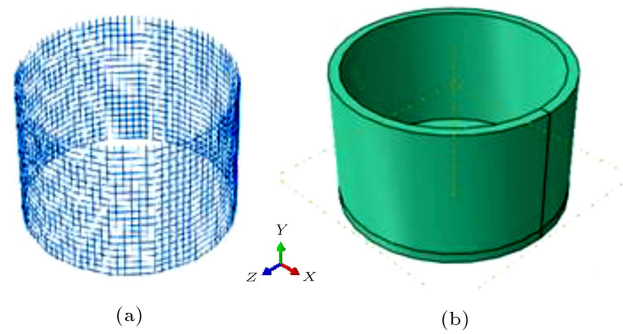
Reinforced concrete water tanks: (a) Rebars and (b) concrete.
